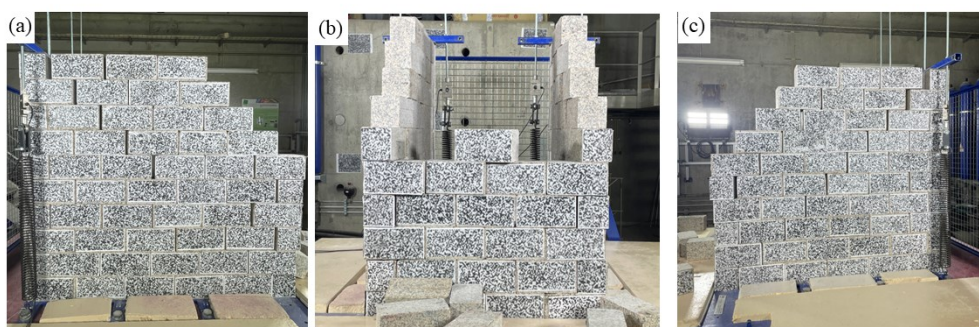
Observed collapse at 0.766 g: (a) top corner of the west return wall involved in the collapse, (b) overturning of the façade, and (c) widened diagonal cracks in the east return wall.
